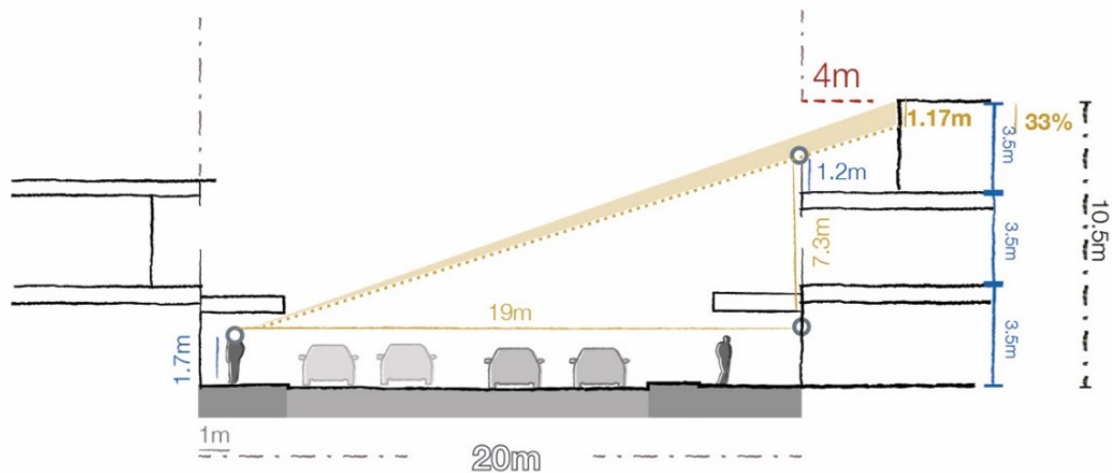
Third storey building setback, indicative diagram (Main Road 20m road reserve)
